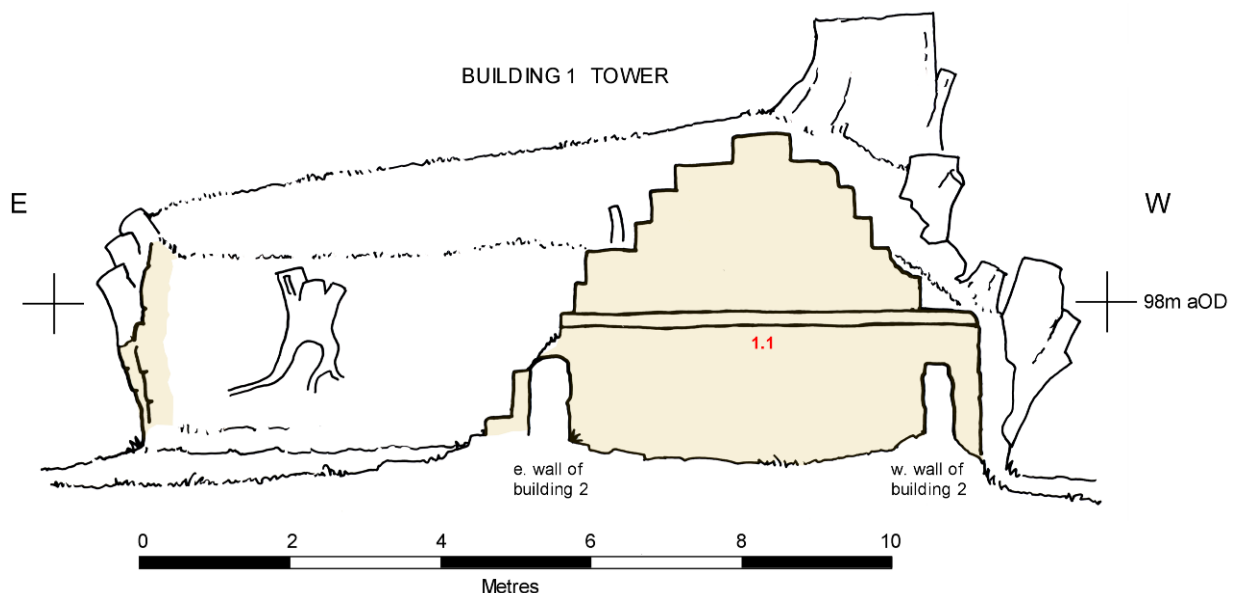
North elevation of the Tower House. Surviving face in buff tone (1:100)
